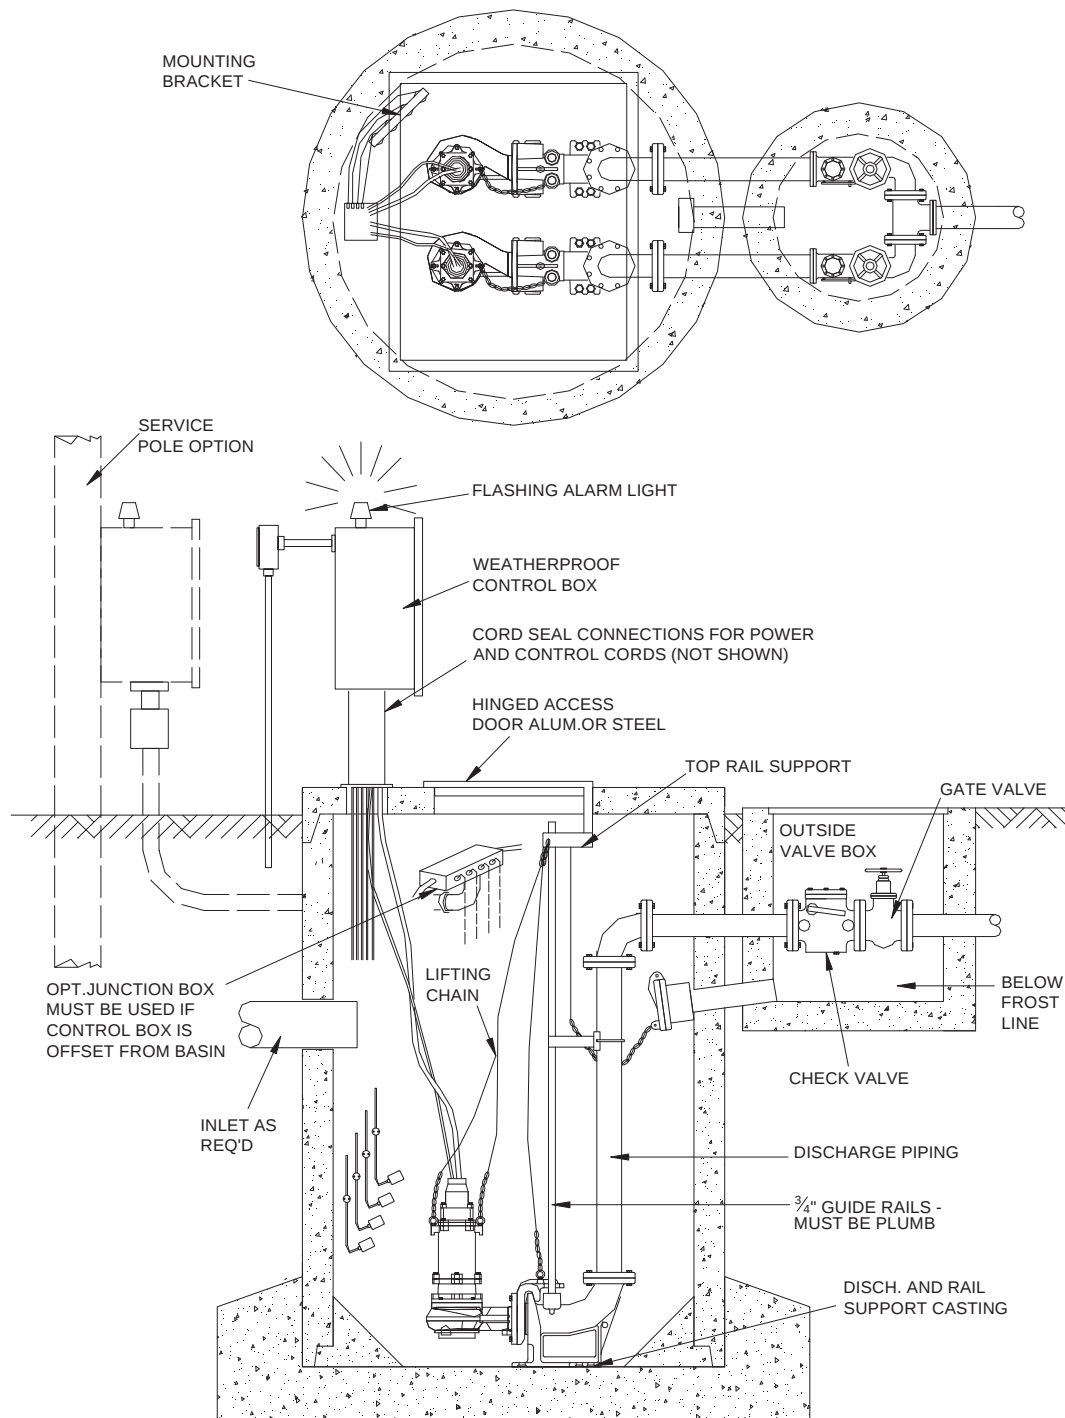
Dayton rail system 20Y788 and installation kit 20Y790 are designed for easy and efficient new installation of sludge pumps.
